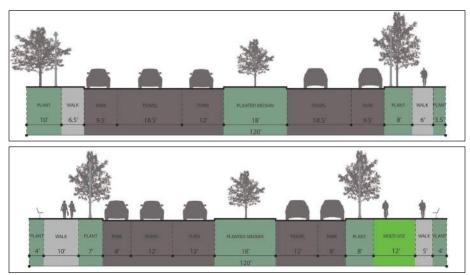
(top) Existing Plymouth Blvd street cross section; (bottom) Proposed cross section
